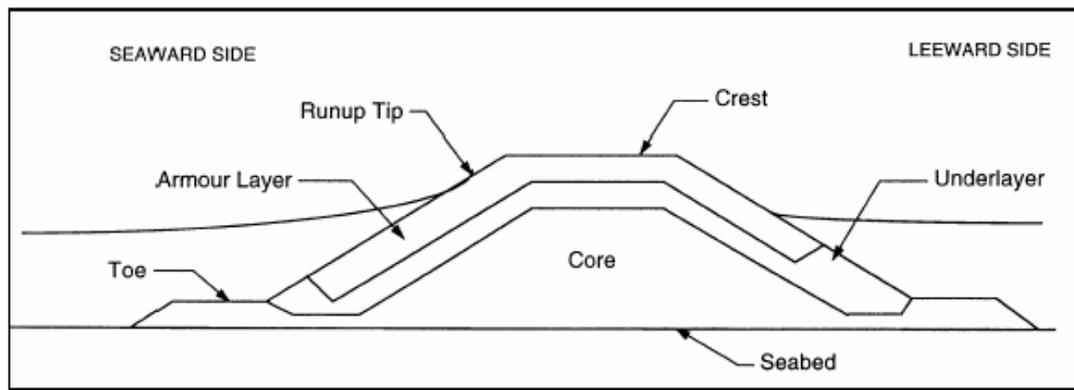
Cross-section of typical multi-layer rubble-mound breakwater (Palmer, 1998)
